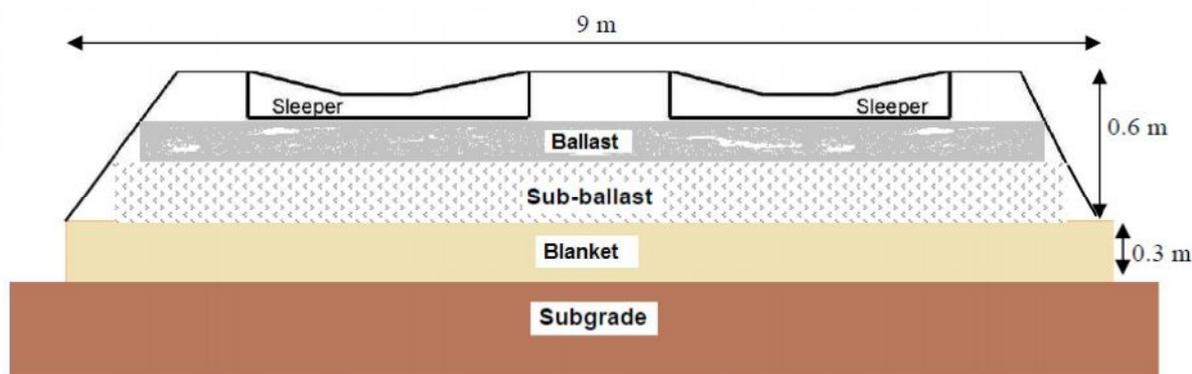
Cross section through a railway line (adapted from Hollis *et al.*, 2004)
